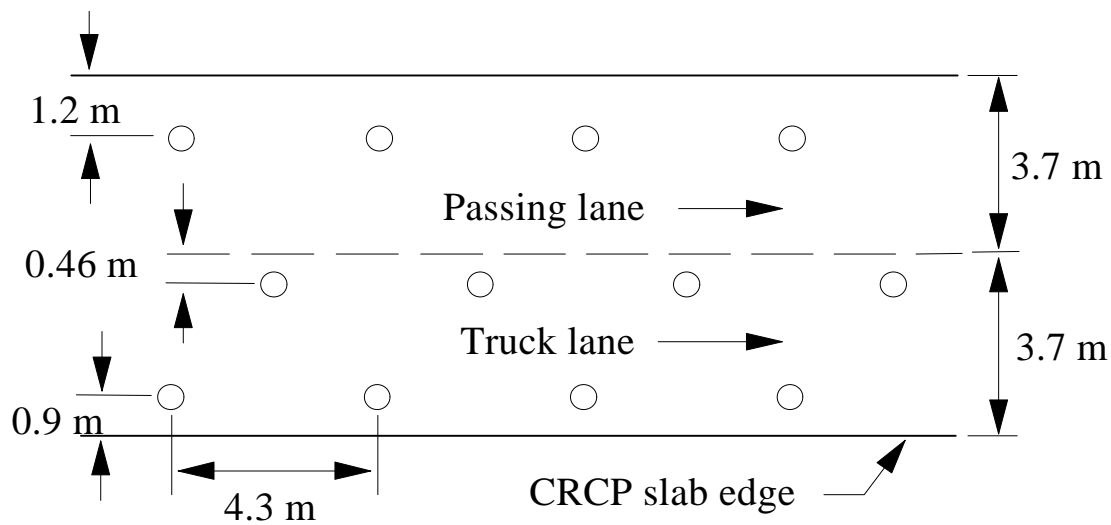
Hole pattern used on a continuously reinforced concrete pavement.
